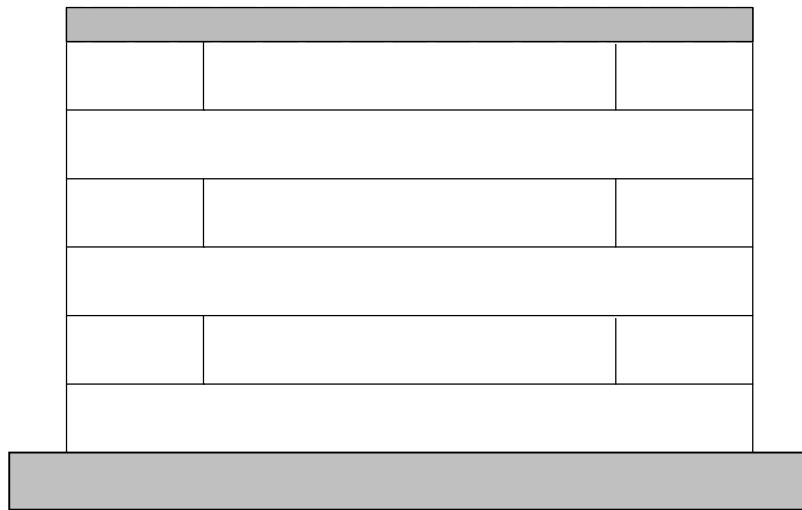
Layout of Shear Wall Pilot Specimen 1 and 2
